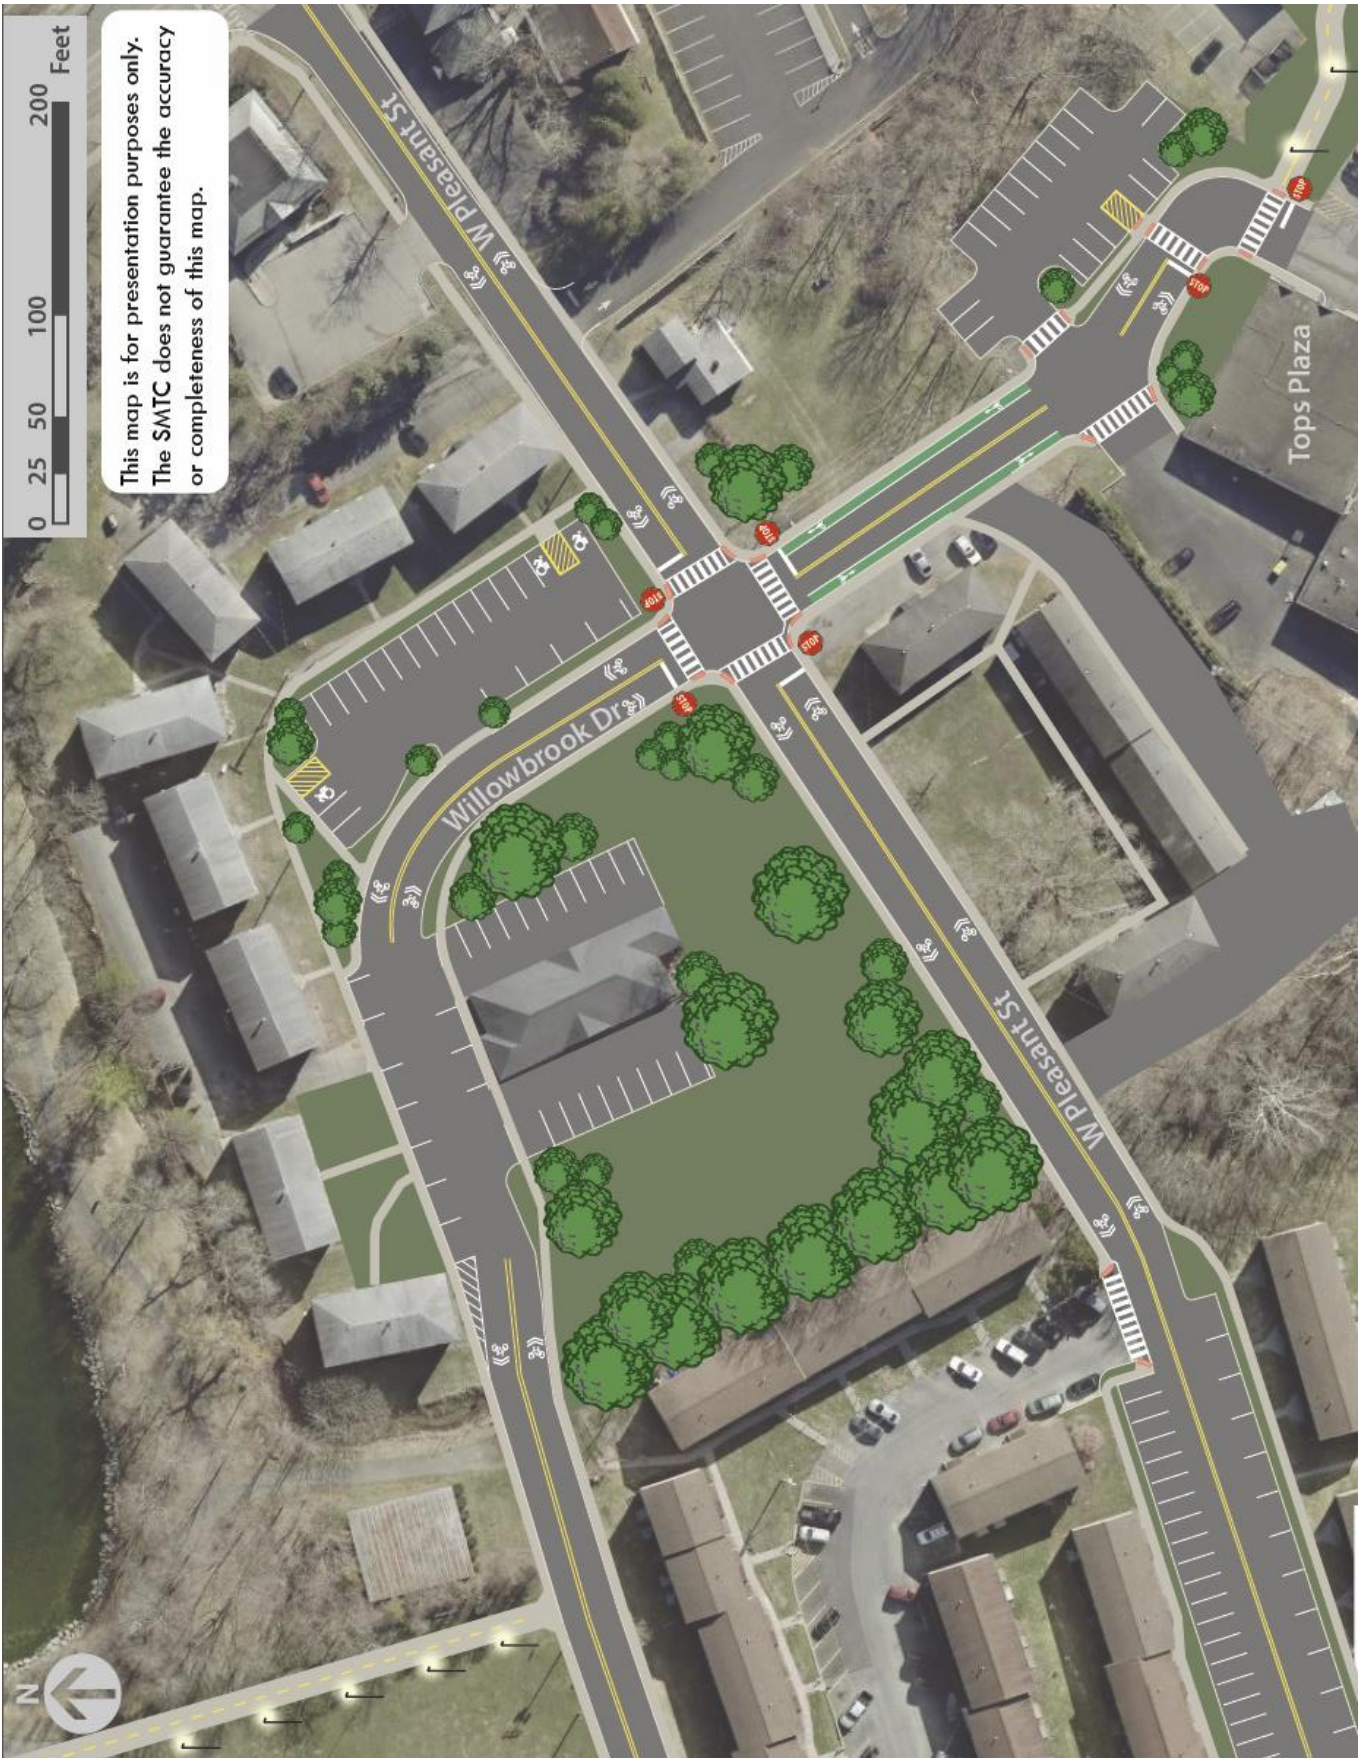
4-Way Intersection Concept for Willowbrook Drive and West Pleasant Street
